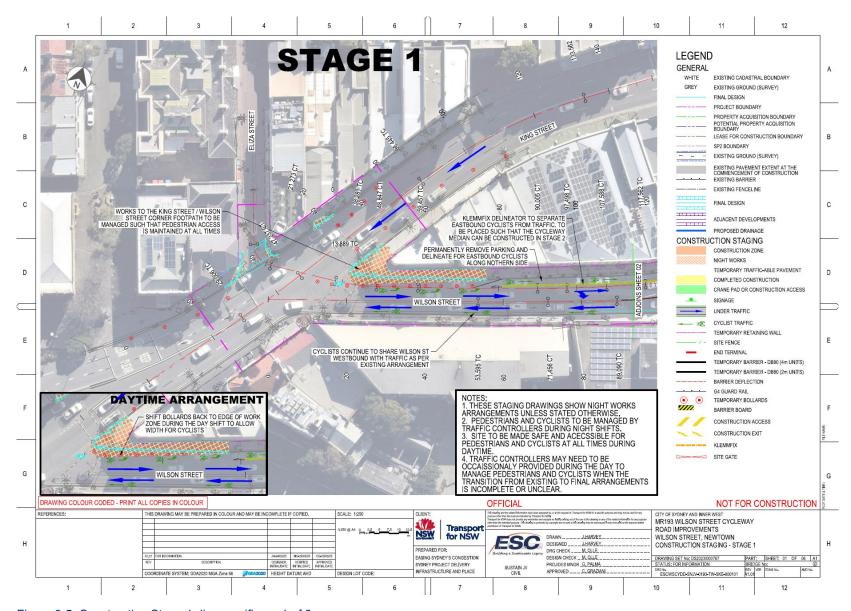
Construction Stage 1 diagram (figure 1 of 2
